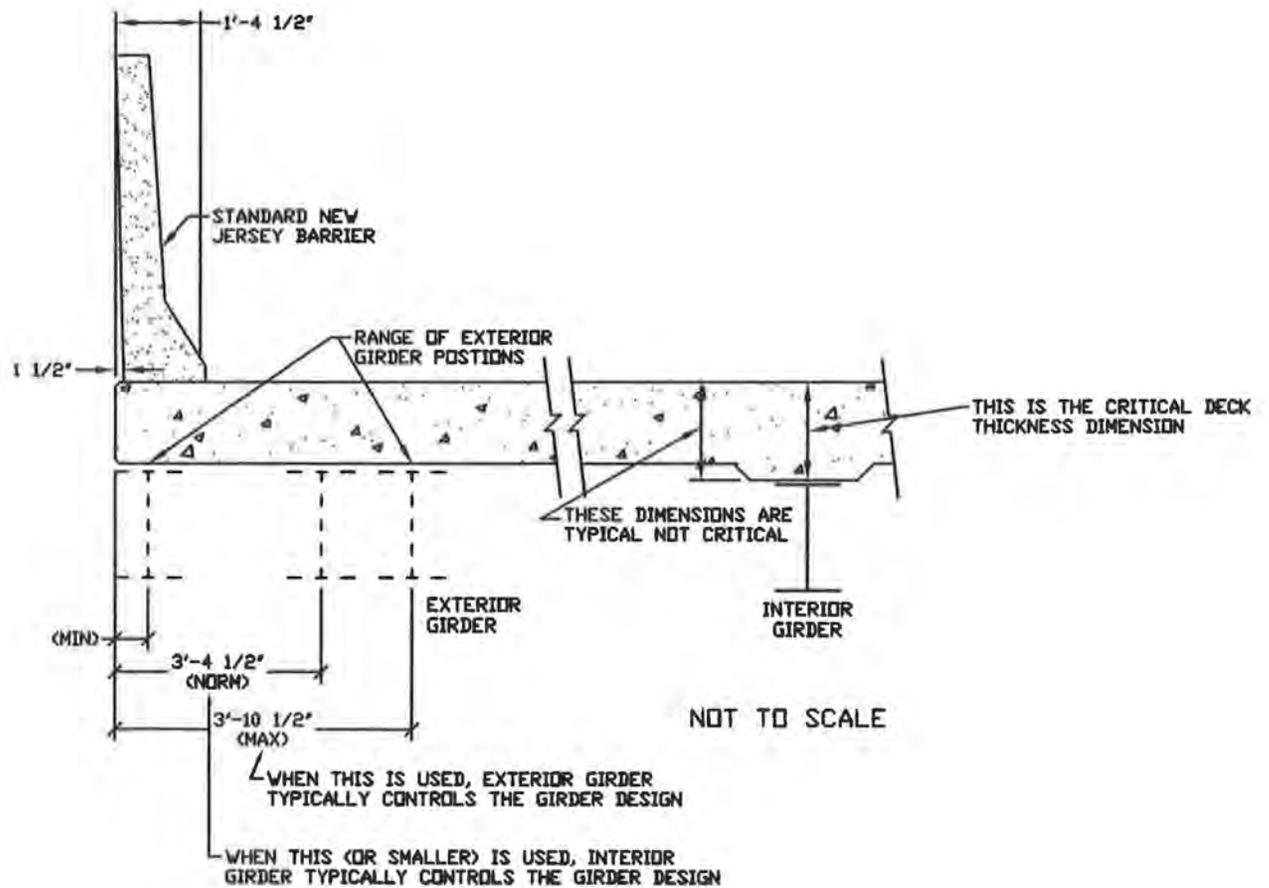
ALDOT Typical Deck-Girder Layout and Geometrics
